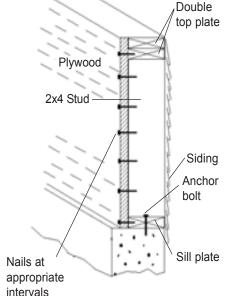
Plywood or diagonal sheathing strengthens weak cripple walls. If your home has a cripple wall between the foundation and the first floor, and the wall is not braced with plywood or diagonal sheathing, the house may fall or shift off its foundation during an earthquake.
